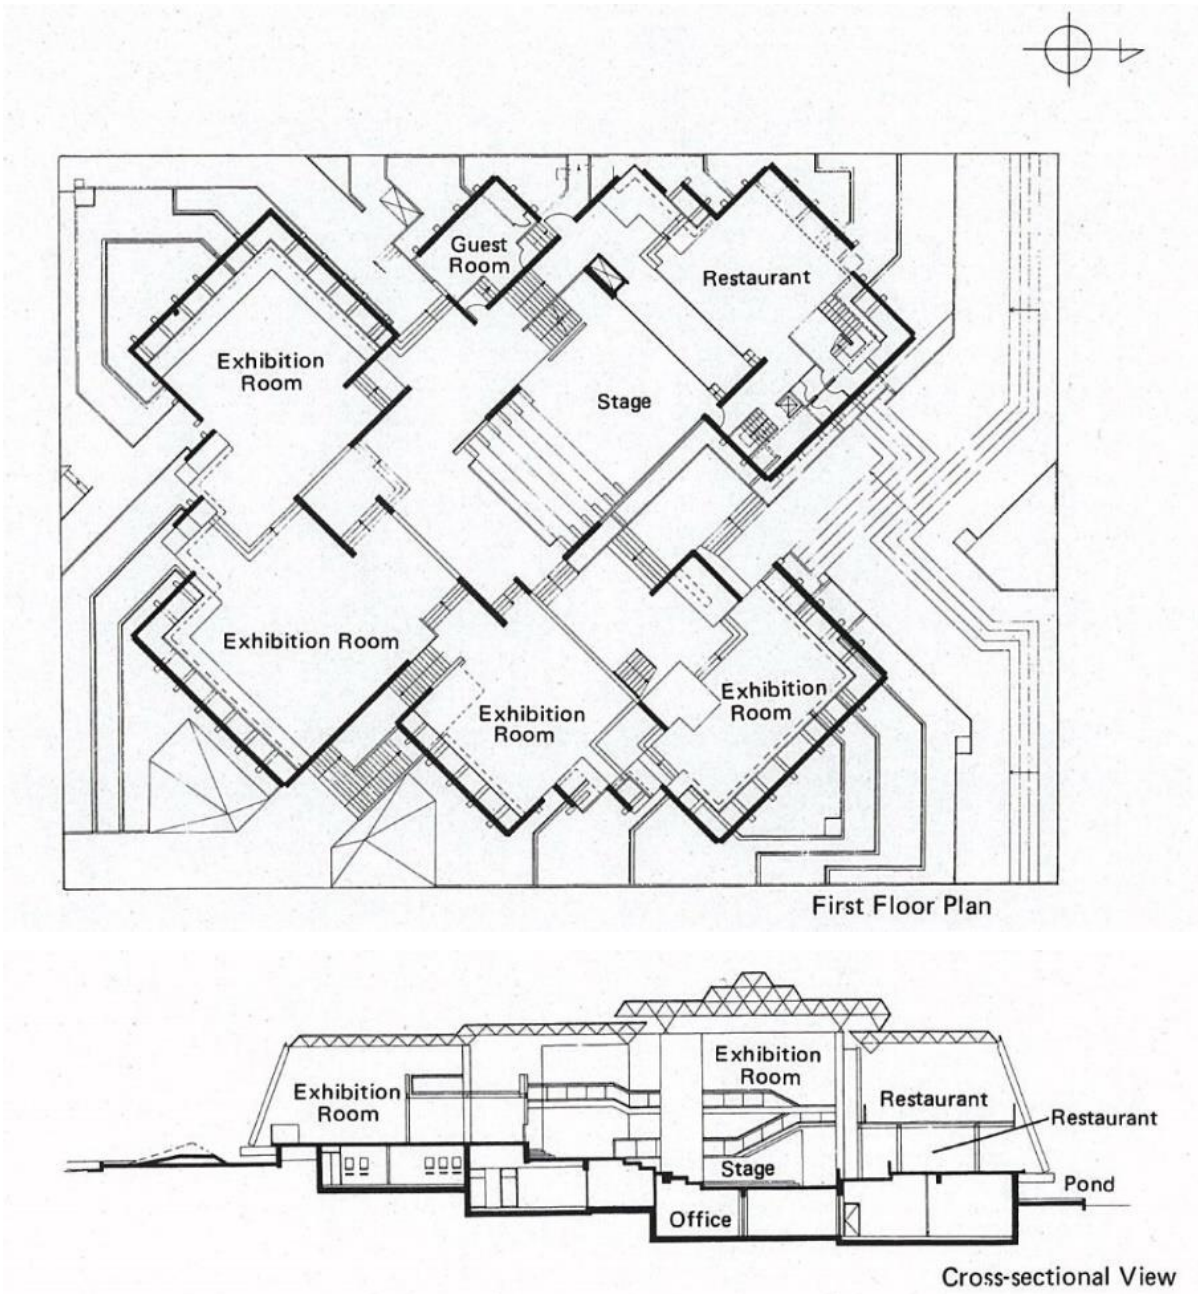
Floor Plan and Section of Pavilion (source: Osaka Expo 70 Memorial Park Collection)
